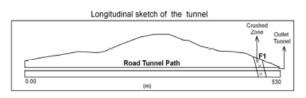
Longitudinal sketch of the Zaker-Sorkhedizaj tunnel showing location of crushed fault zone in the tunnel.
